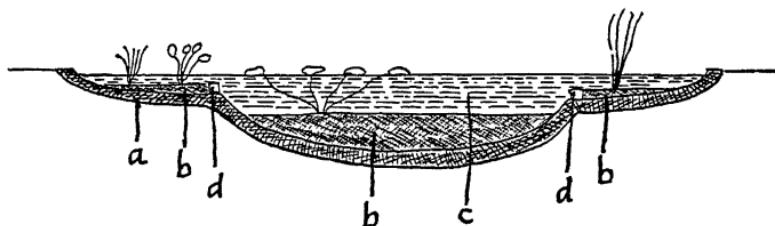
Section of informal concrete pool. a) concrete; b) soil; c) water; d) low wall of concrete or stone.
